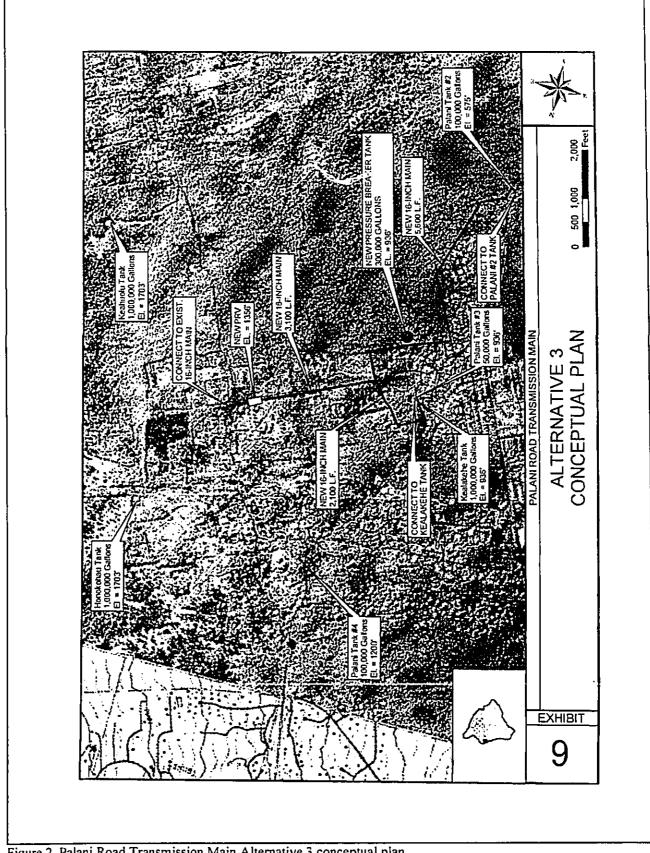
Palani Road Transmission Main Alternative 3 conceptual plan.
